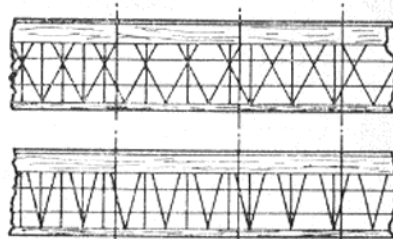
GEODETIC & WARREN GIRDER CONSTRUCTIONS.
